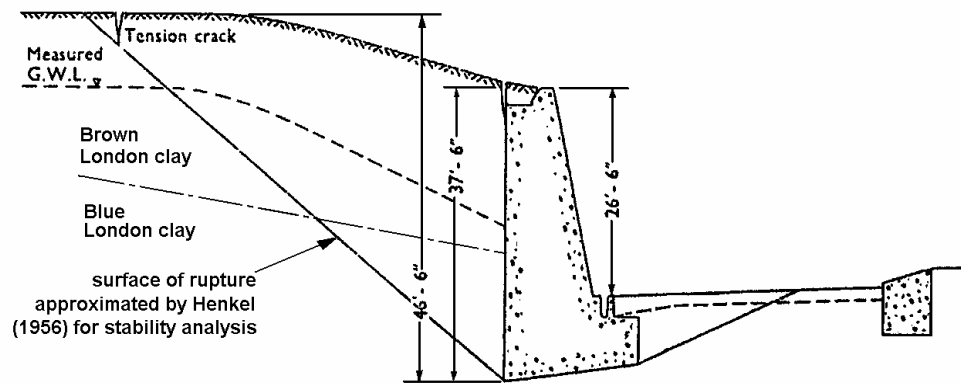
Failure in the retained cut slope in London clay at Uxbridge in 1954 (adapted from Henkel 1956)
